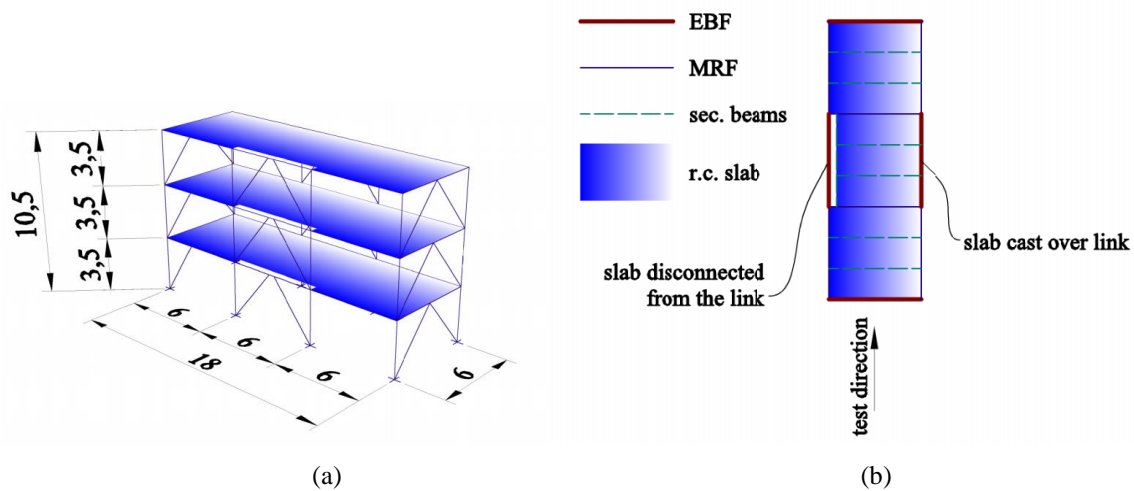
3D view (a) and plan layout (b) of the experimental mock-up.
